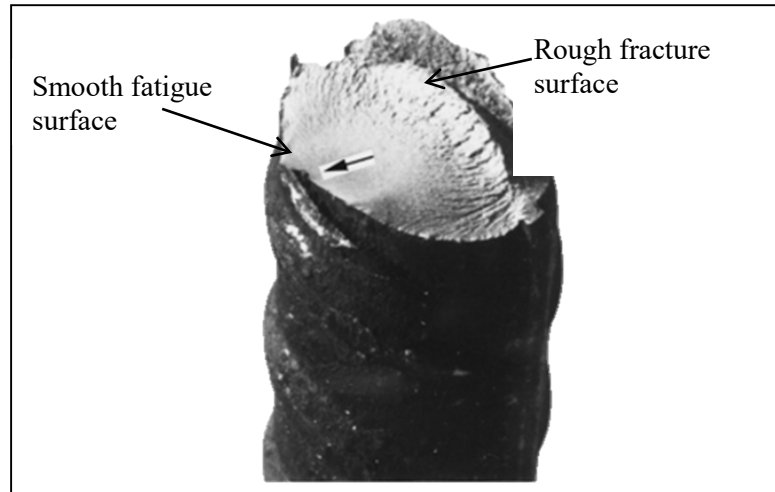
Fatigue failure of a steel reinforcing bar with crack initiating from a sharp identification mark (Zheng & Abel, 1998)
